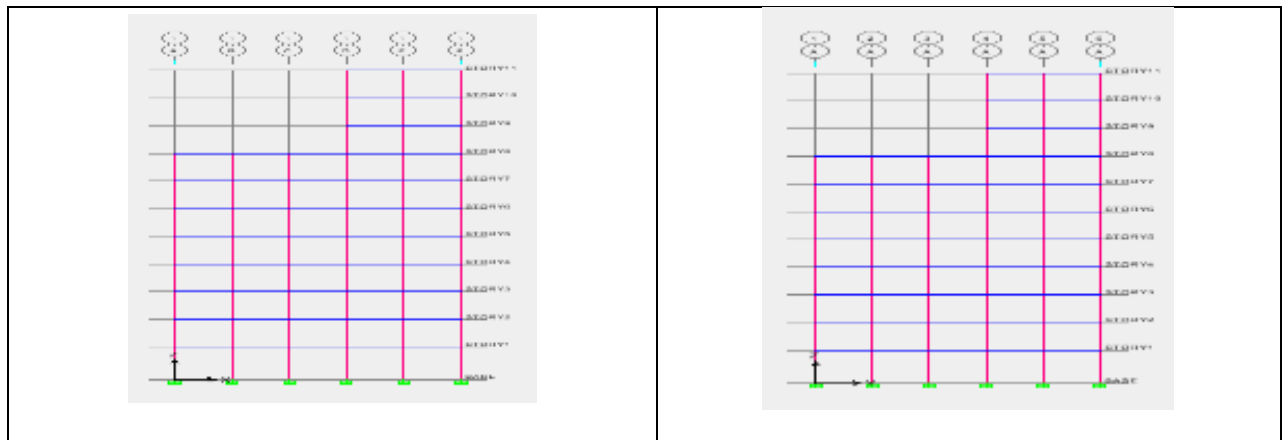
Elevation of Asymmetric building Model-1 along longitudinal and transverse direction
